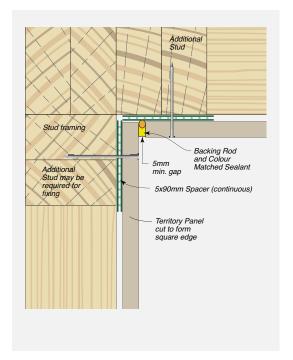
External Corner Detail – With Coloured External Corner Trim – Plan View
